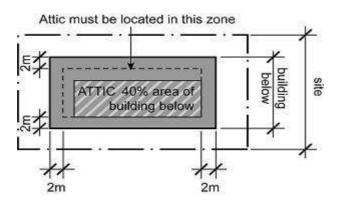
Plan showing attic zone 40% of level below, and set back from perimeter walls.
